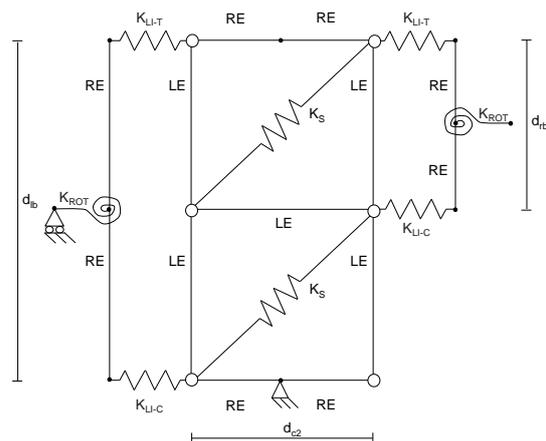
Beam-to-column joint model with beams of unequal depth – double panel (DP) model.
